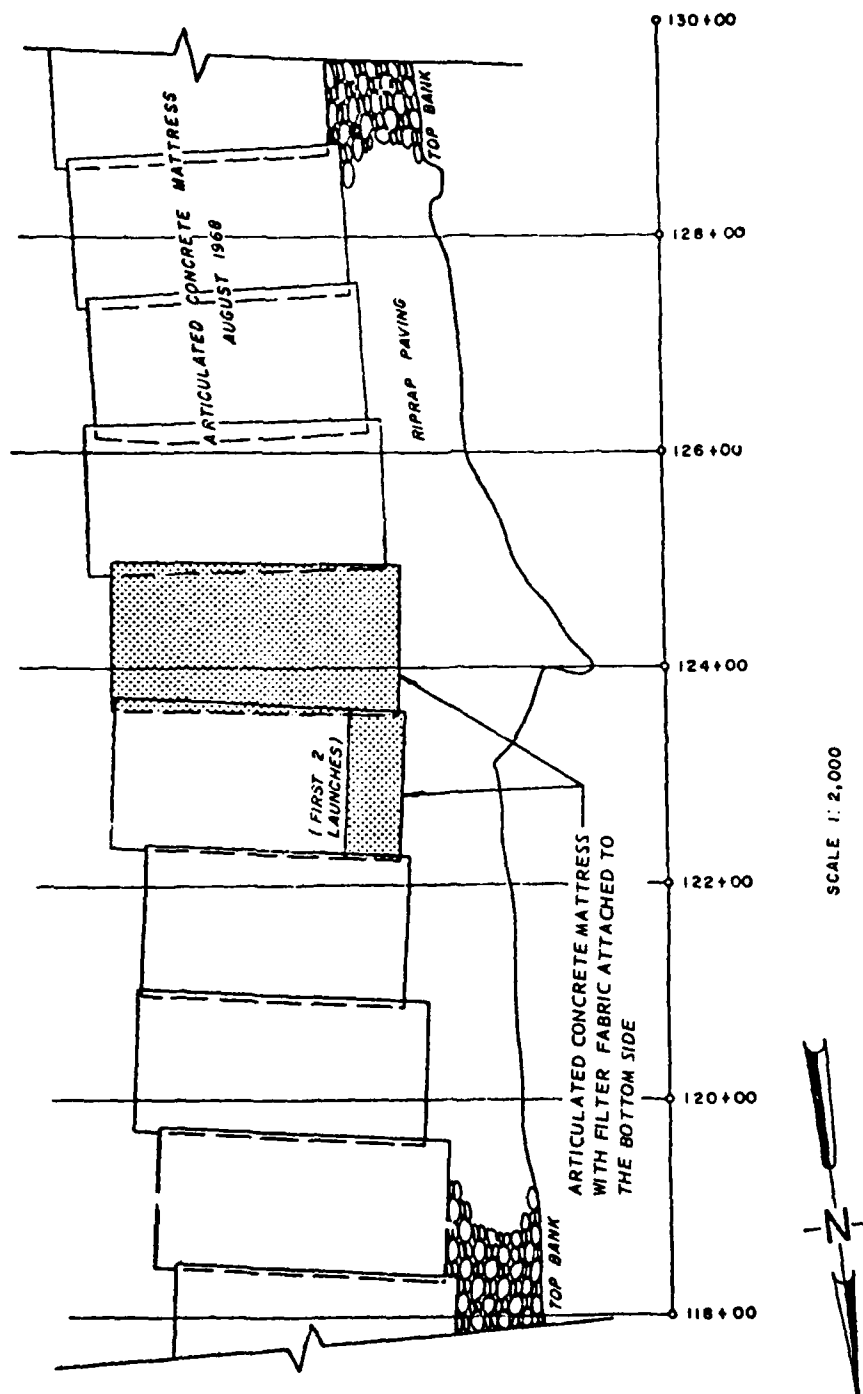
Plan view showing articulated concrete mattress revetment placed at Island 40 on the Mississippi River near Memphis, Tenn.
